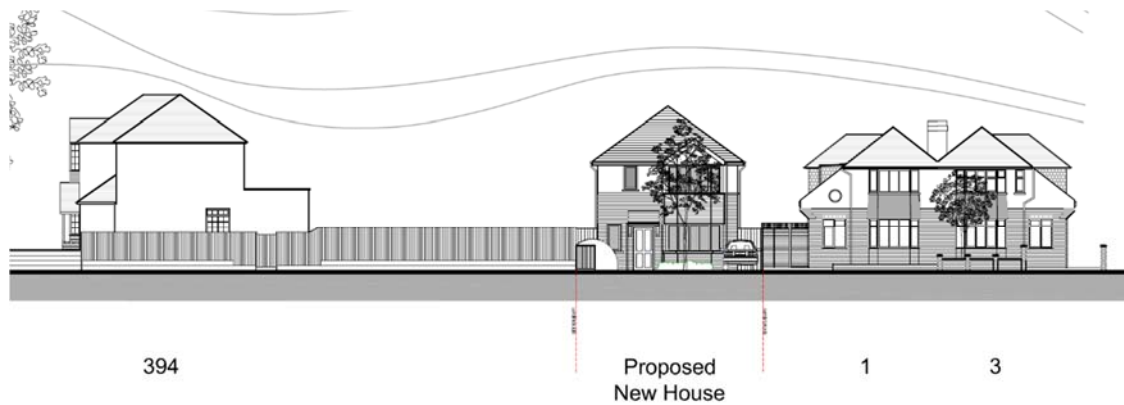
Streetscene elevation of the dwelling proposed under ref 23/00880/FUL
